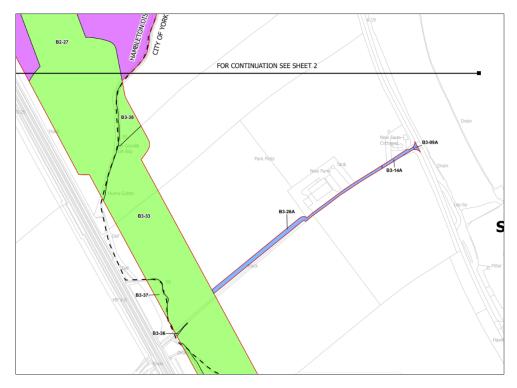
Change 2 New Farm Cottage Access – After Change Application Land Plan Section B Amendments
